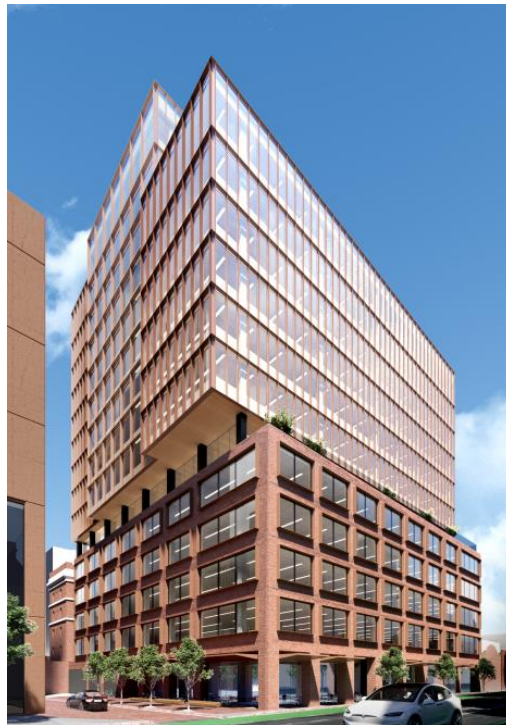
Endorsed northern elevation of No. 61-71 Wellington Street and 37-39 Langridge Street
